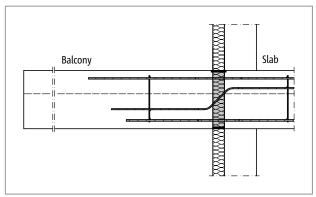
Schöck Isokorb® T type B: Balcony structure with freely cantilevered downstand beams (precast balcony)
